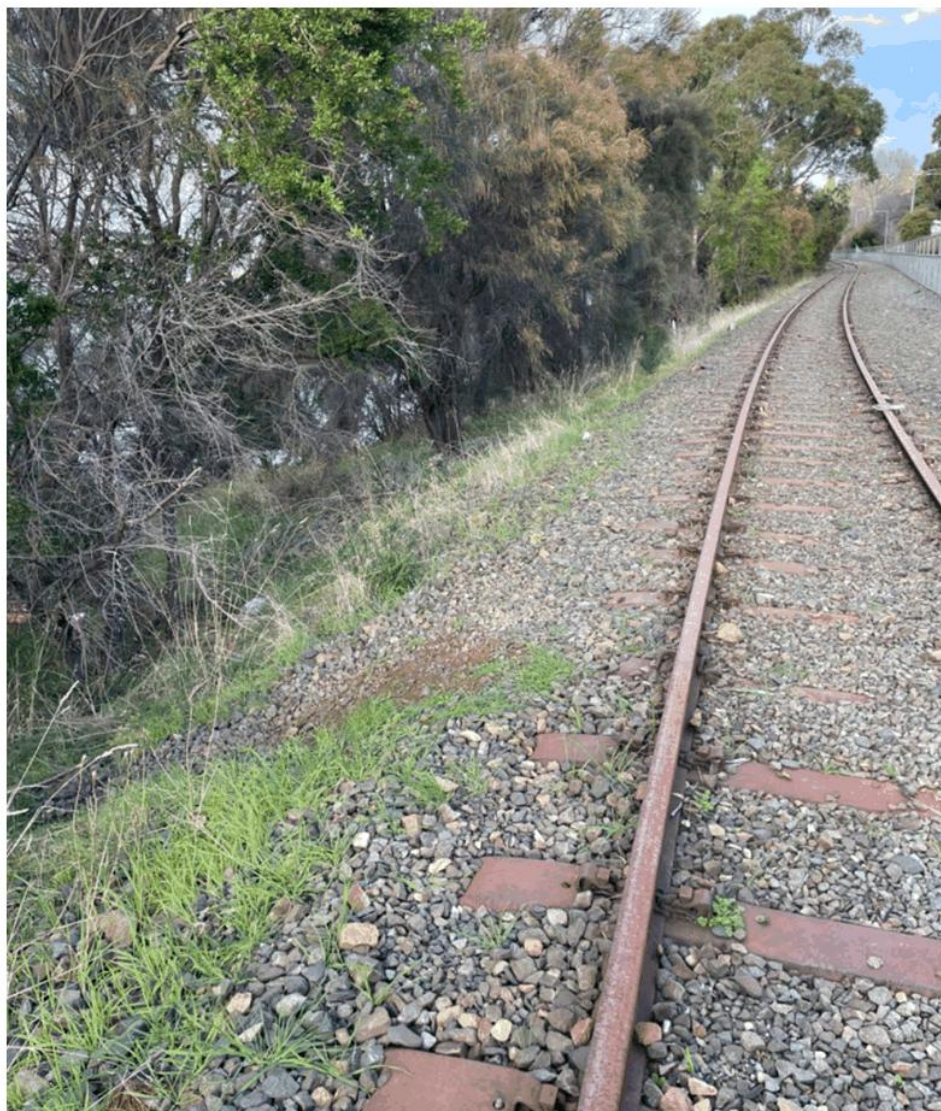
Proposed site for standard rail crossing to connect Cornelian Bay Foreshore Track on City of Hobart land to the Intercity Cycleway
